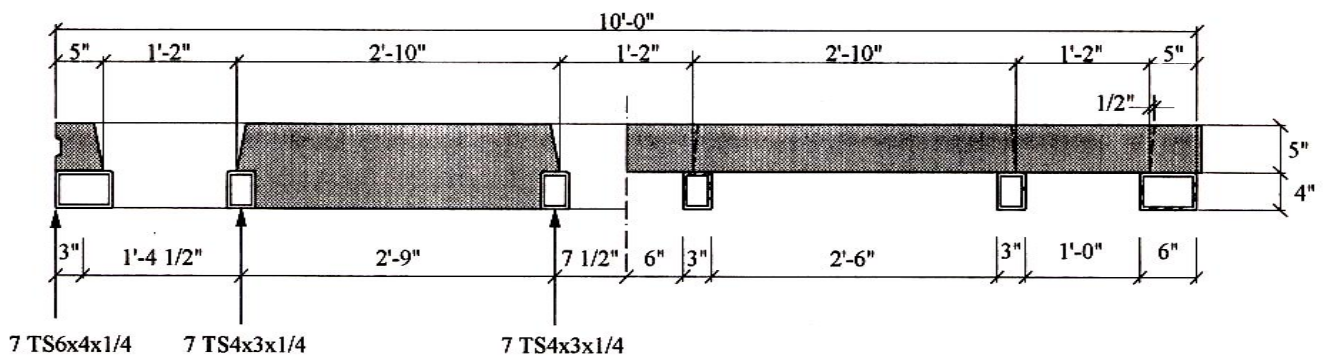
Cross section view of the Effideck system (Section B-B)
